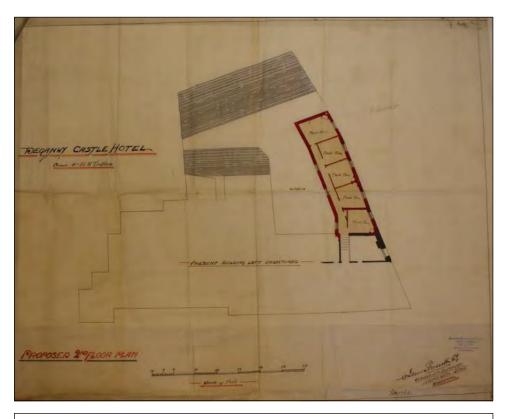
Proposed Modifications to the Deganwy Castle Hotel 1898. Source: Conwy Archives Doc C Maps & Plans 23/1/131
